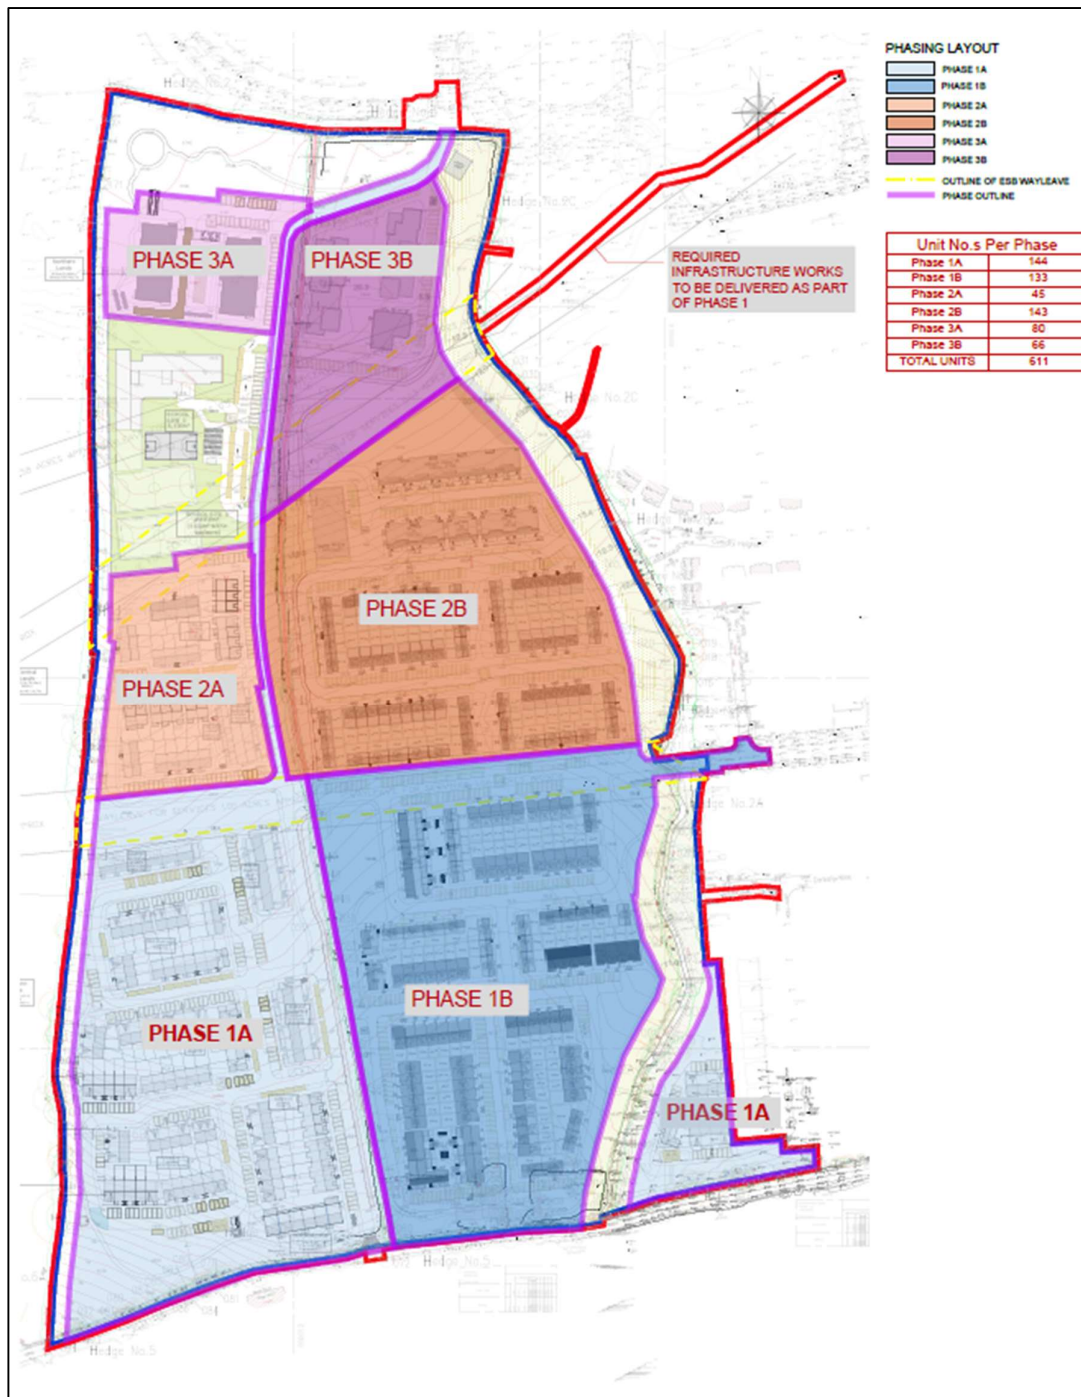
Site Phasing Plan (MCORM, 2025)
